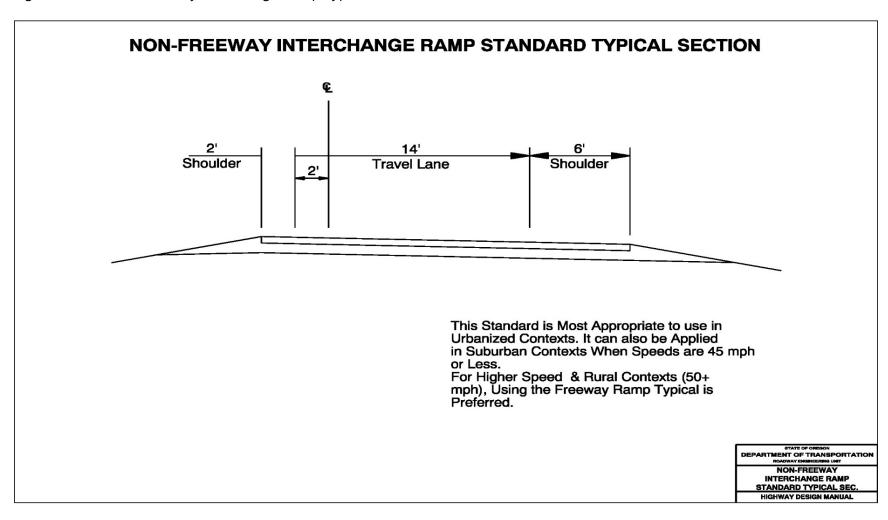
Non-Freeway Interchange Ramp Typical Section
